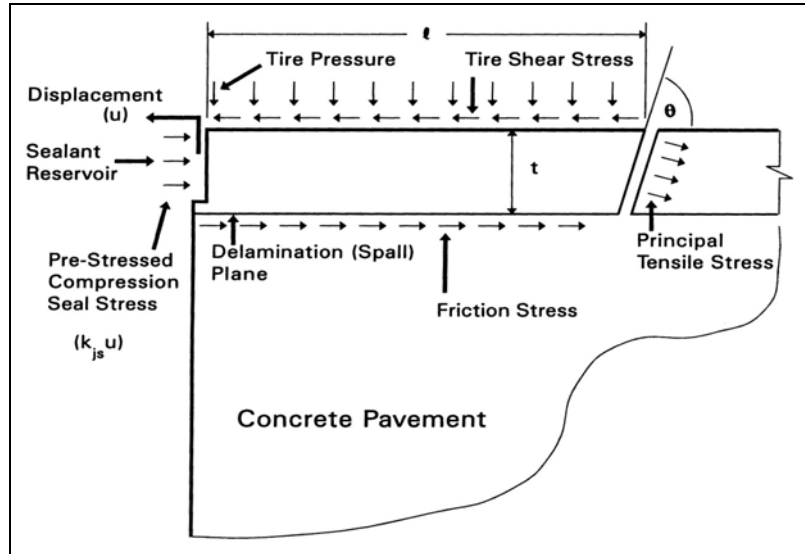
Concrete Pavement Spall Mechanism and Model (Tang et al., 1993).
